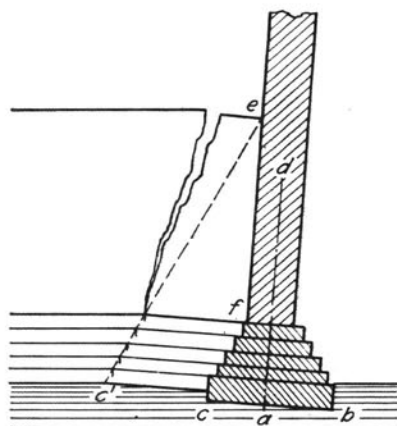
APPLICATION OF METHOD OF ISOLATED PIERS TO OUTER WALL AND ABUTTING DWARF-WALL
